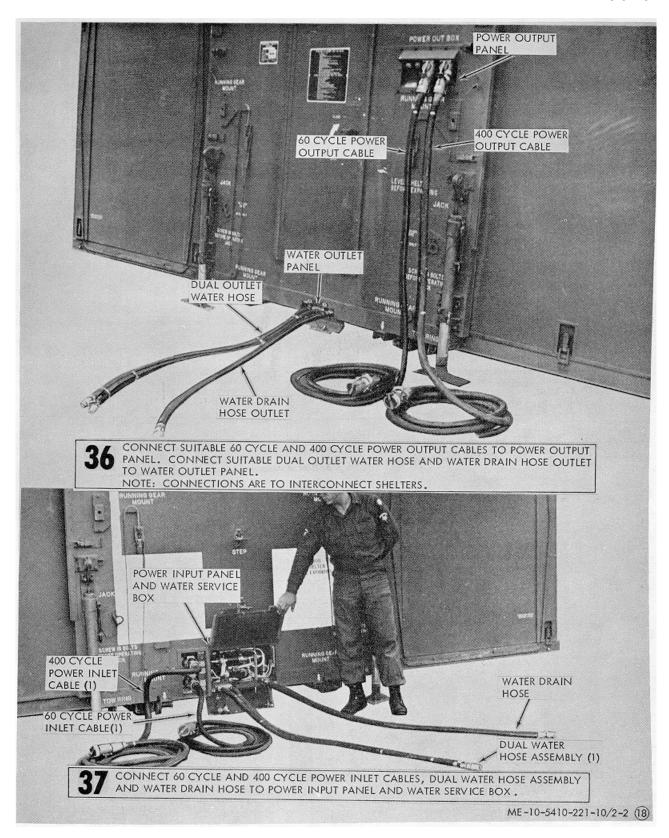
(18). Erection of expandable shelter, (sheet 18 of 18).
